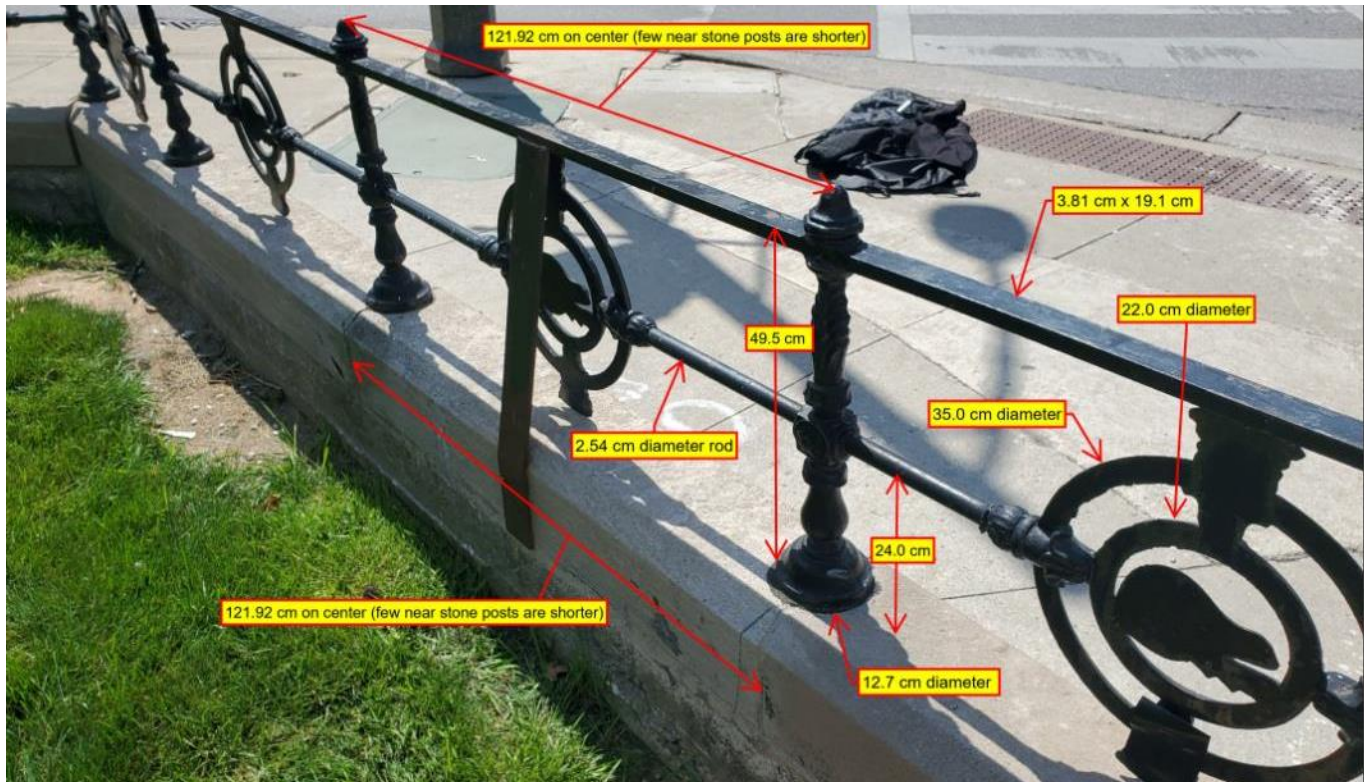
Example of the back-support brace (AECOM, February 2021)
